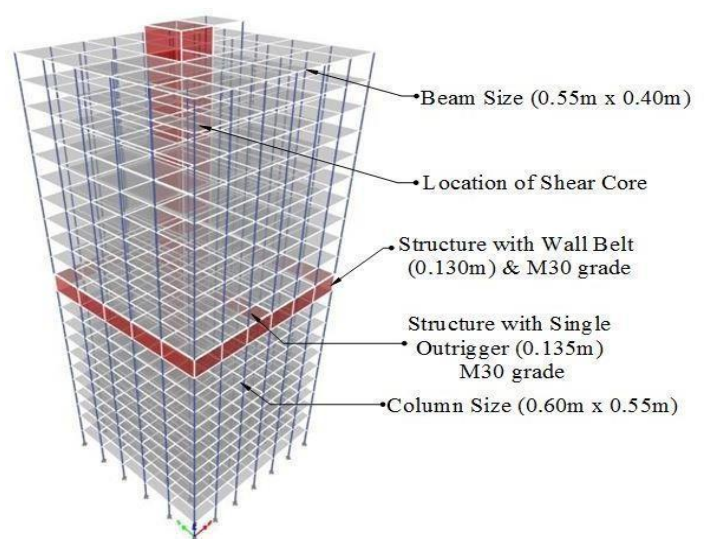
Case OTS2: Single Outrigger and Wall Belt Supported System at B1 with Dual Core
